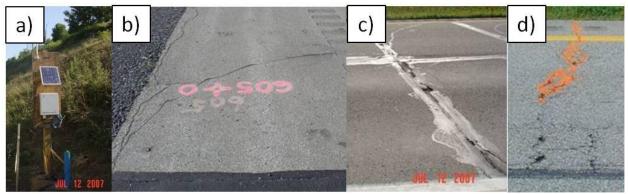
Panel B5 photographs showing (a) data acquisition equipment, (b) corner breaks, (c) transverse joints, and (d) transverse cracks (Photographs from PA DEP files).
